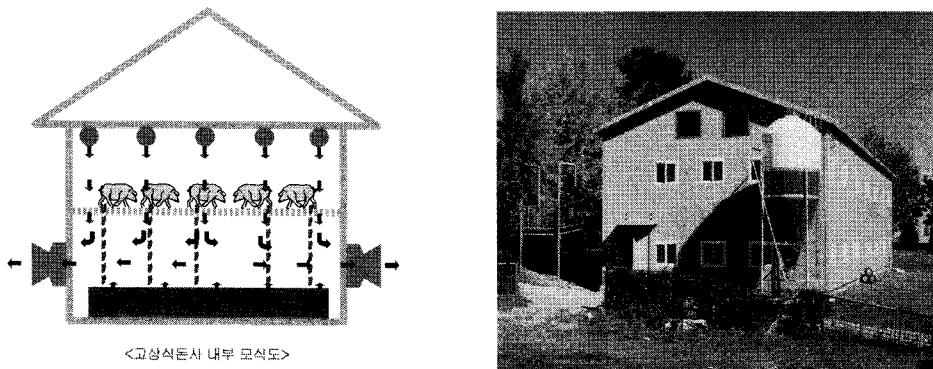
Illustration and photo of an on-going construction of a two-storey pig building at NIAS in Suwon.
